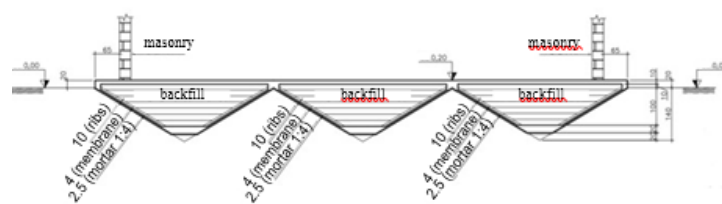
Hyperbolic paraboloid slab foundation cross section
